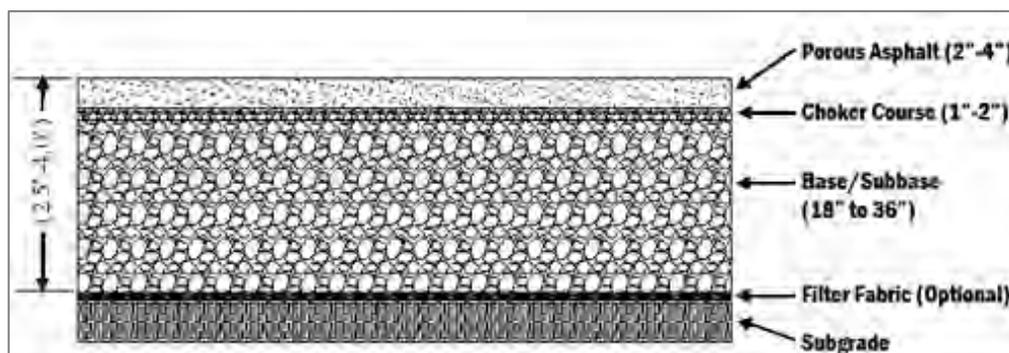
Typical Porous Asphalt Pavement Section (diagram adapted from USEPA, 1986)
